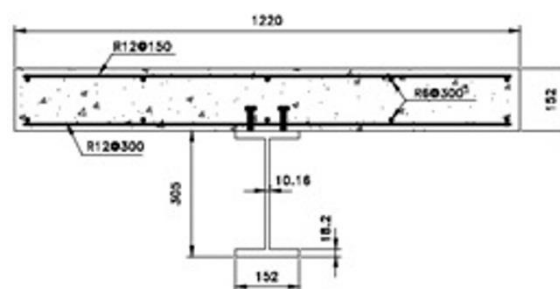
Cross section of the tested composite beam in Ref. [2] (dimensions in mm)
